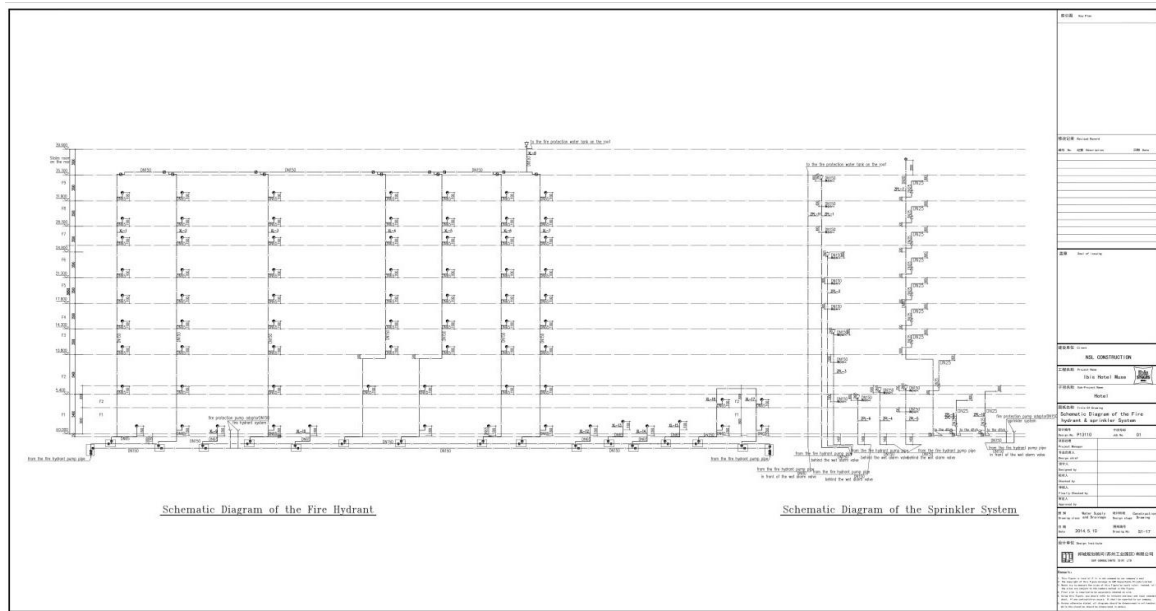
Schematic diagram of the fire hydrant and sprinkler system
